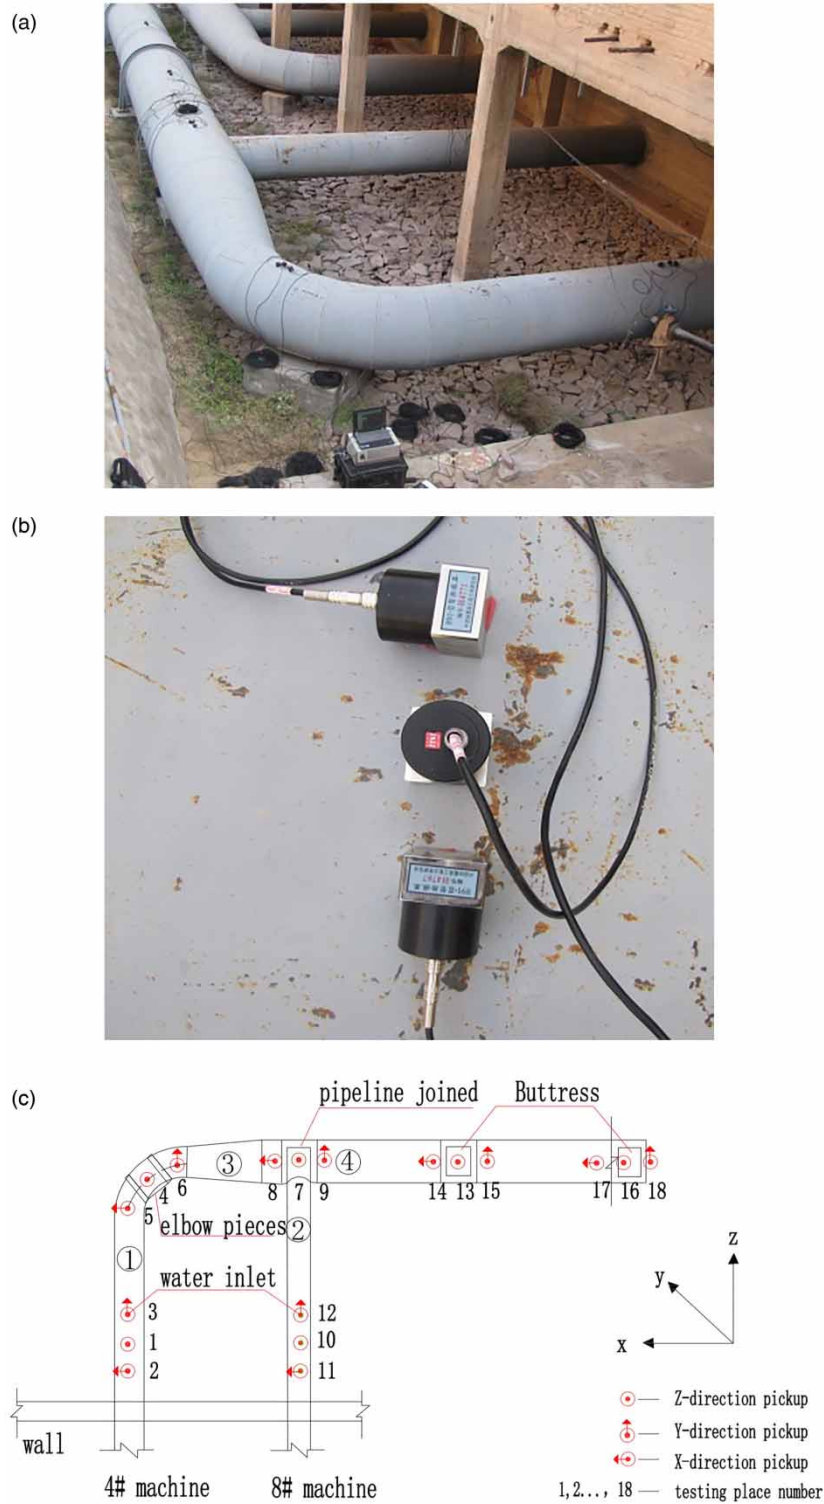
| (a, b) Pick-up site layout and (c) survey point layout.
